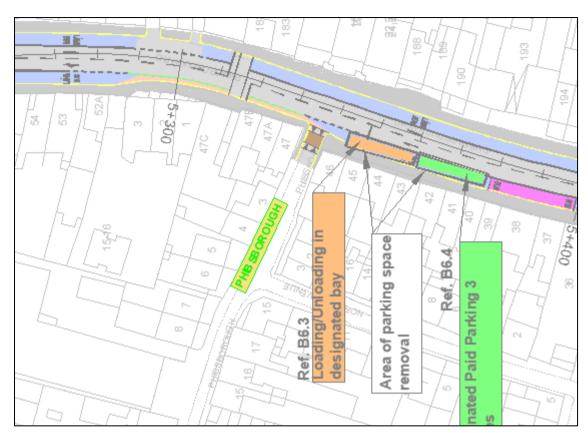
Proposed scheme design and parking changes along Phibsborough Road.
